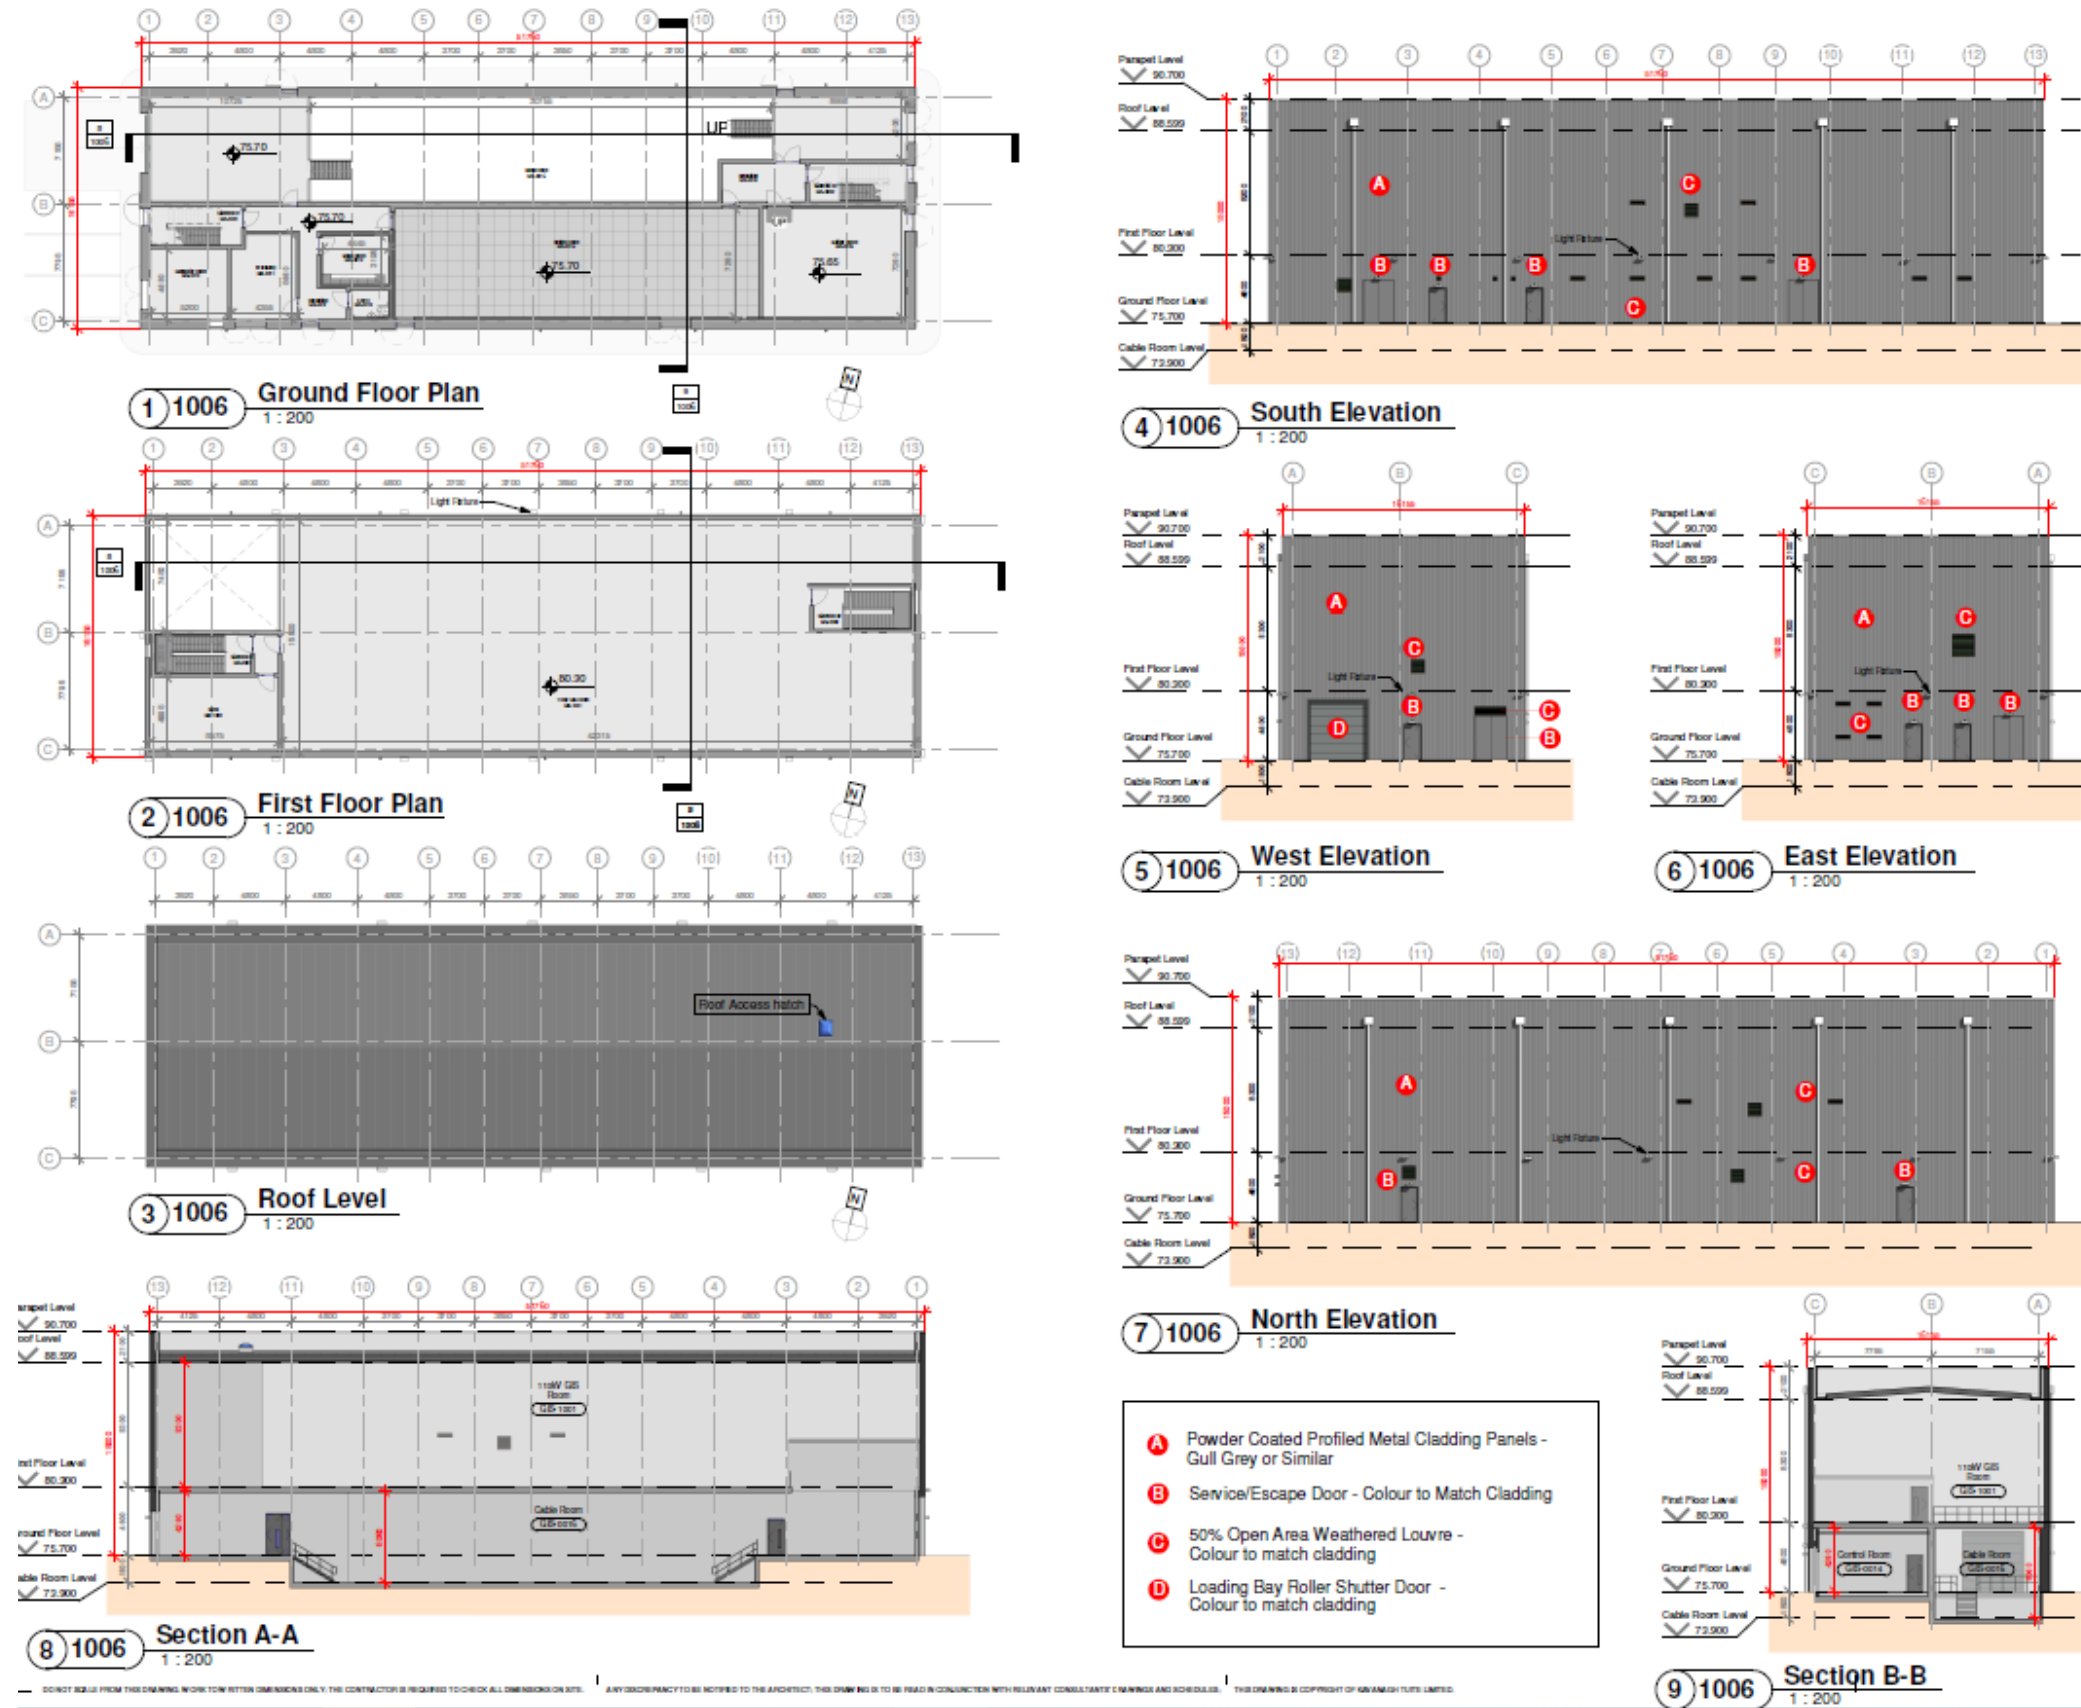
GIS Substation sections showing Material Palette and Façade Detailing (Source KTA)
